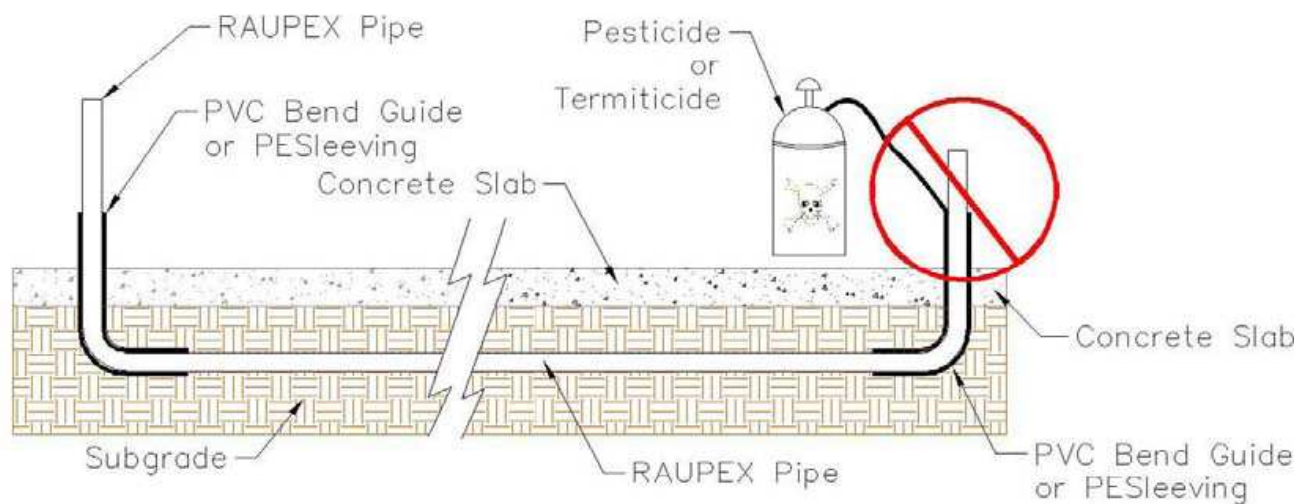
Recommended installation of RAUPEX pipe under a slab.
